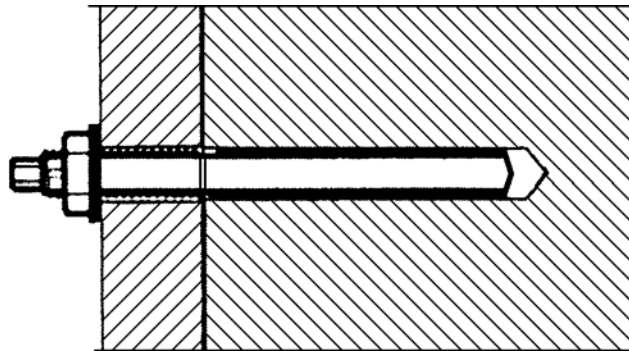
Anchorage made using CHEMFIX PESF ARCTIC bonded anchor
